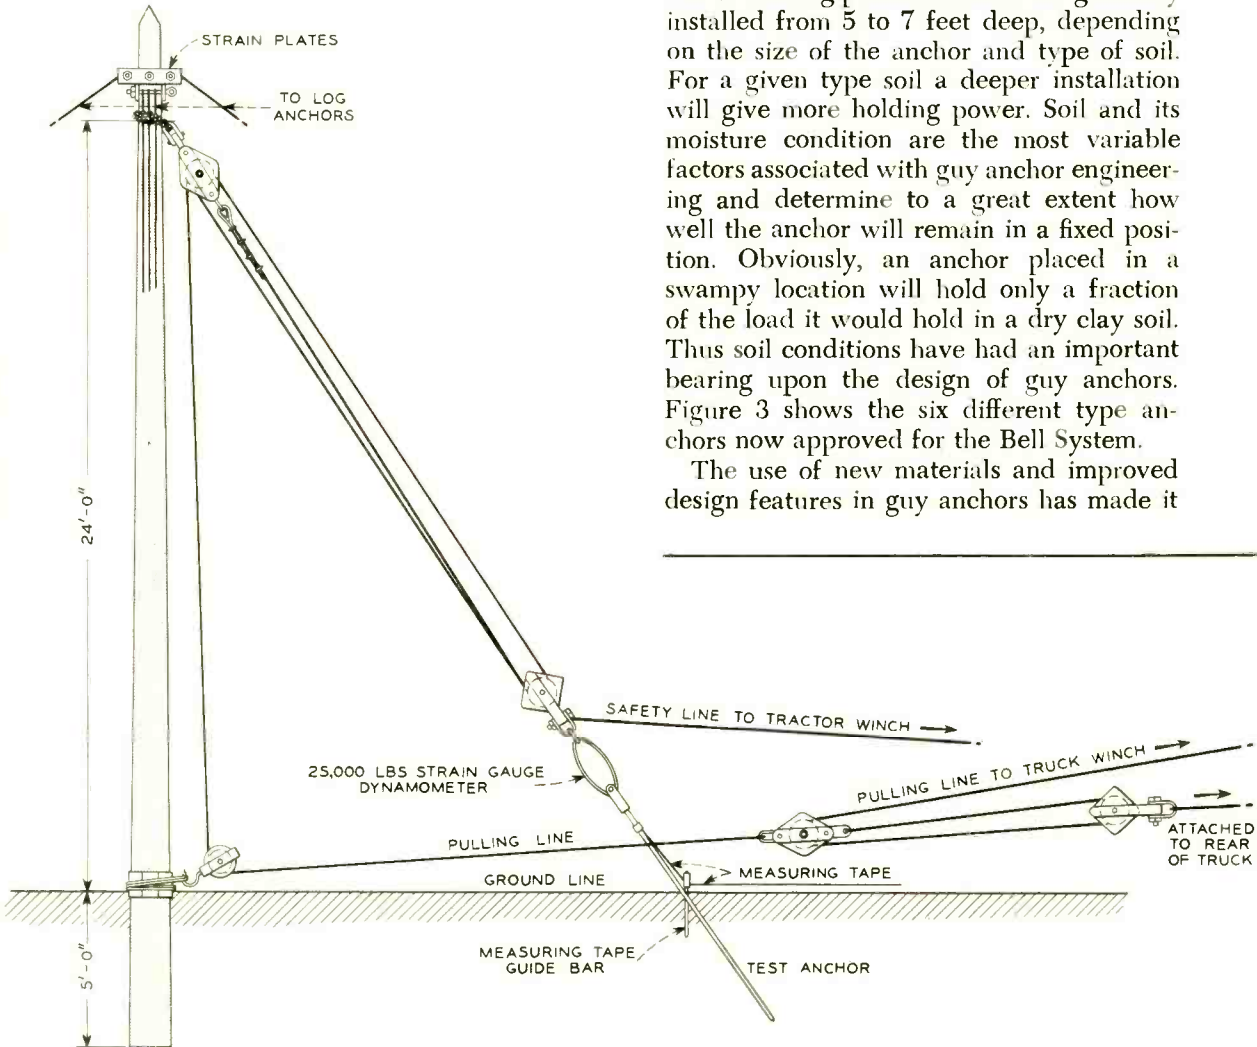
Typical setup used at Chester Laboratory for testing anchors.
